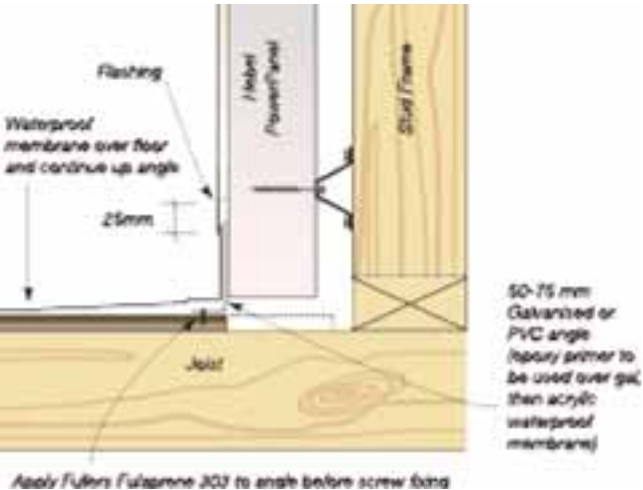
Roof to Wall Junction Detail - Option 1
